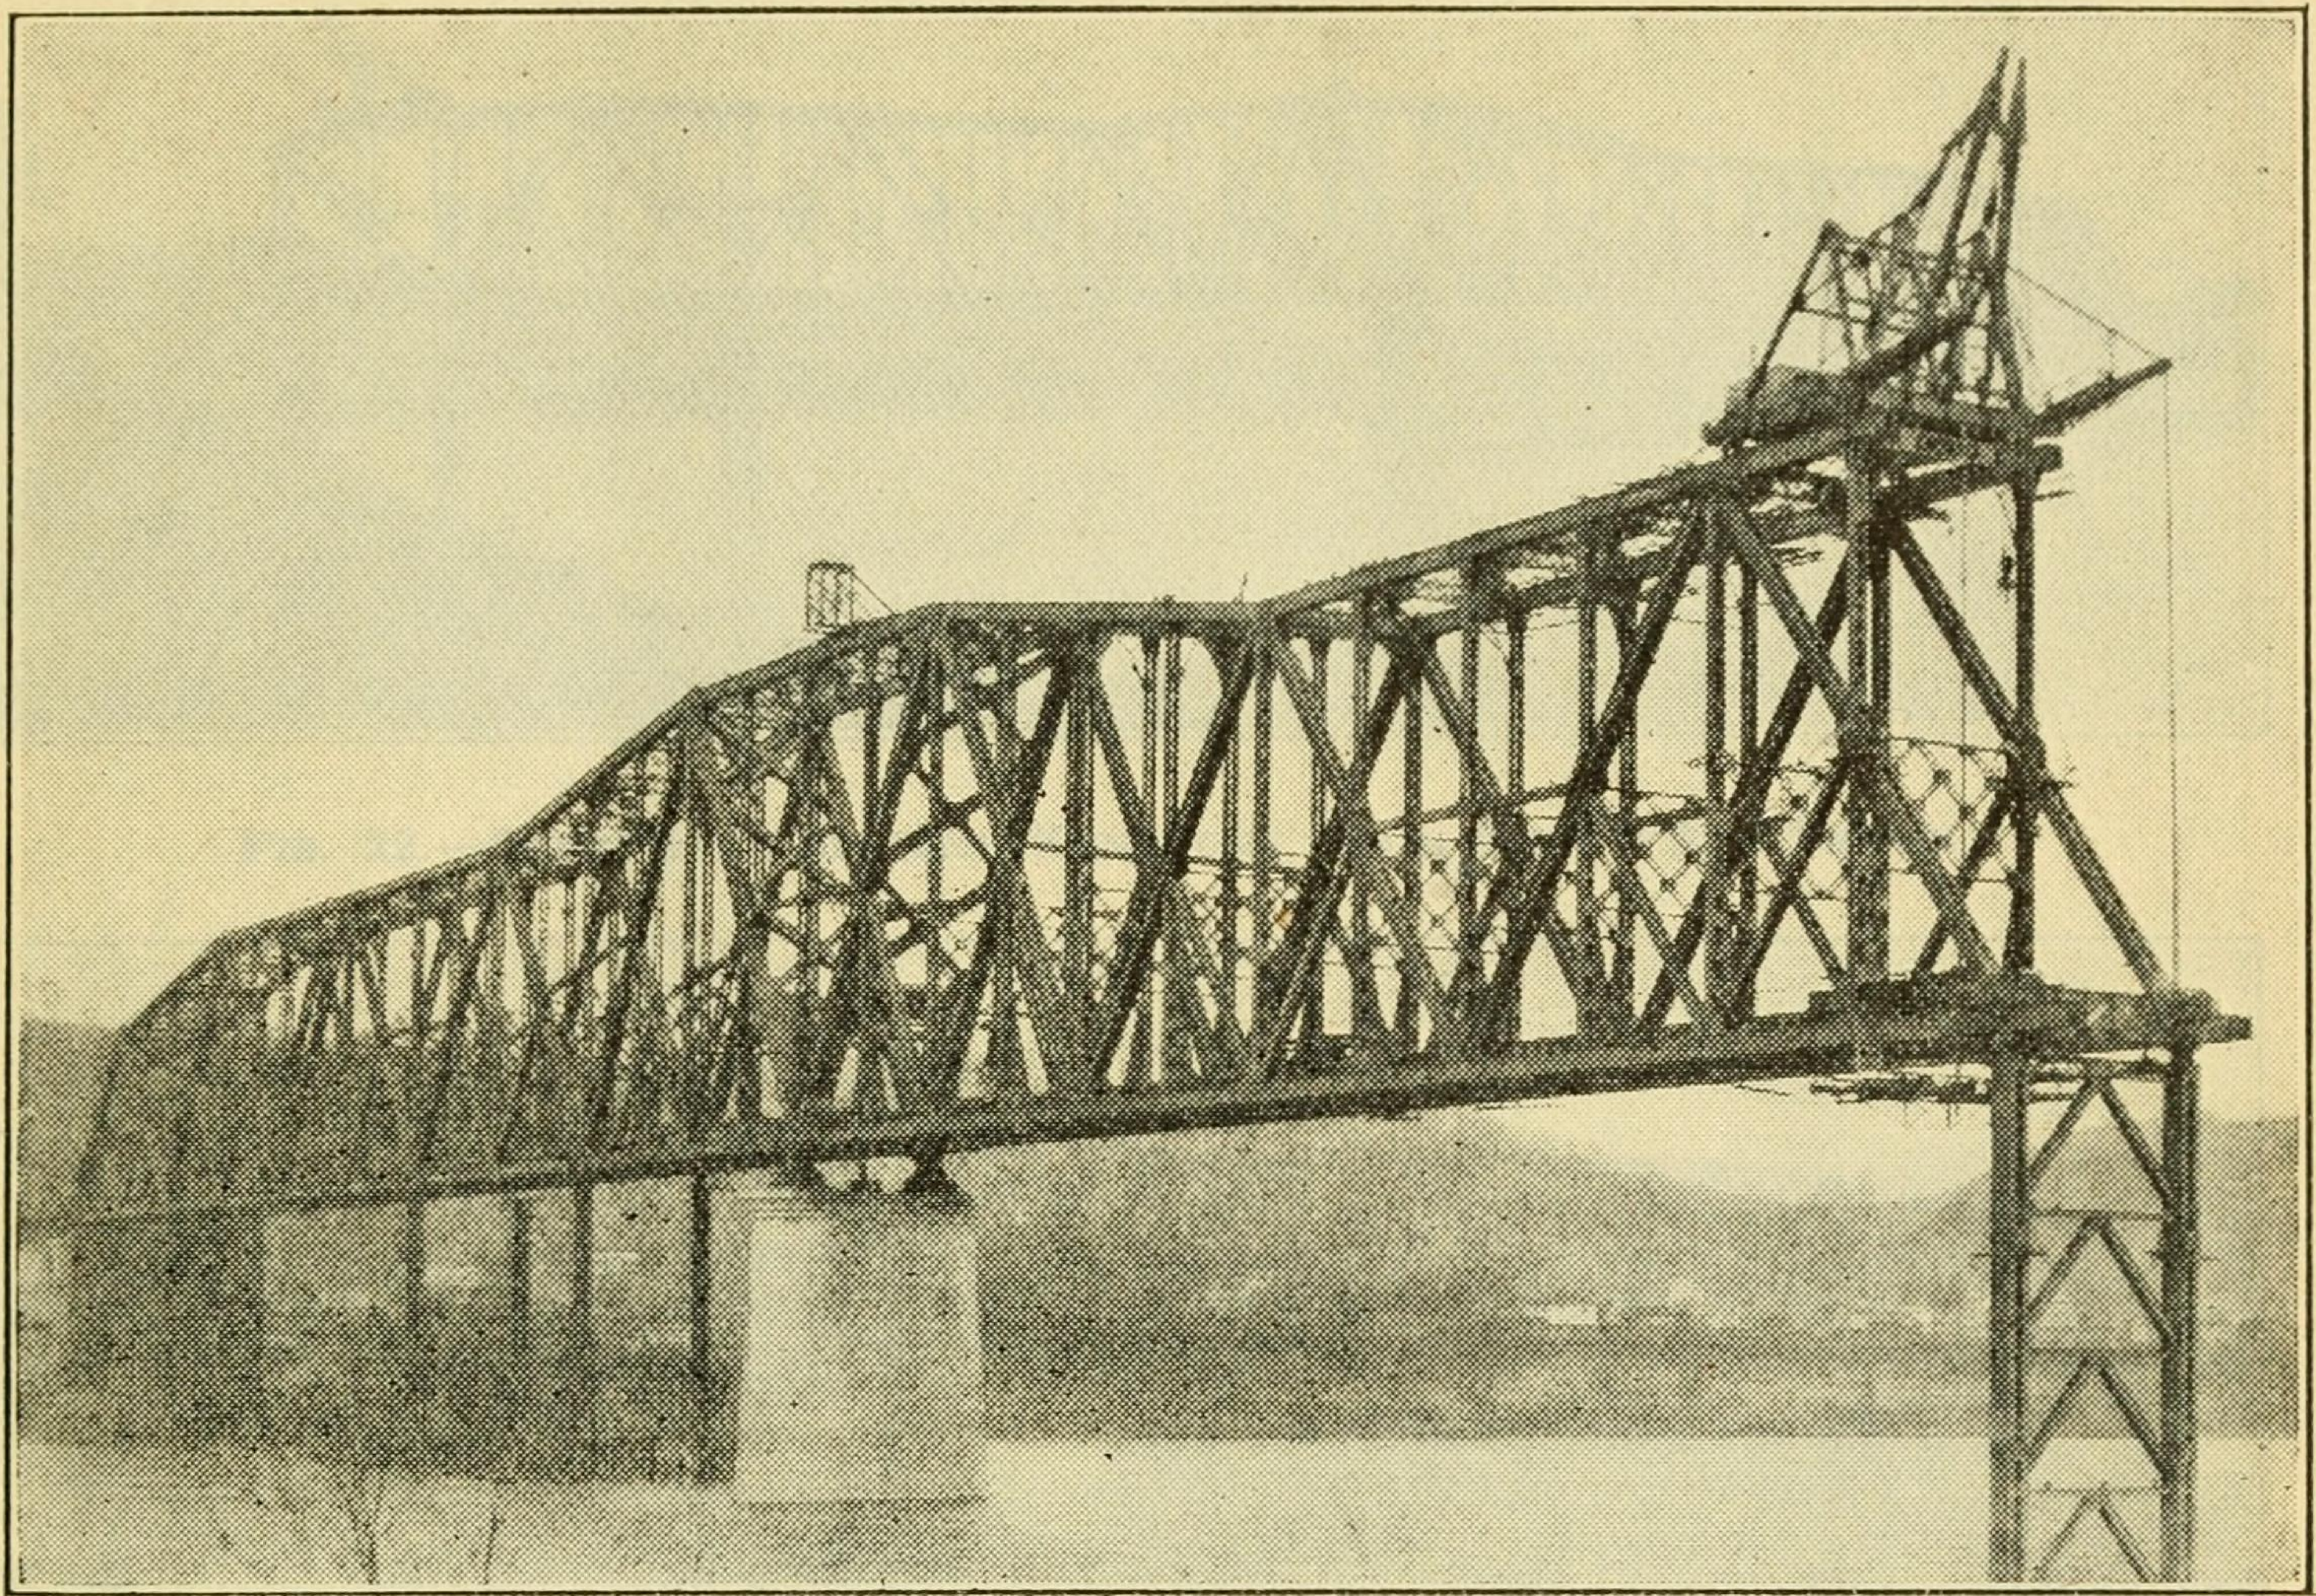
CANTILEVER ERECTION, KENTUCKY SPAN, AND FALSEWORK UNDER OHIO SPAN REMOVED, SCIOTOVILLE BRIDGE.
